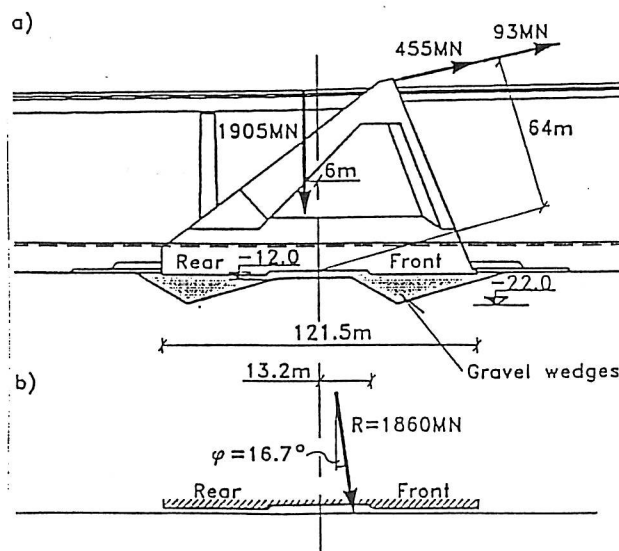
(a) Section of anchor block; (b) Load resultant acting at foundation level
